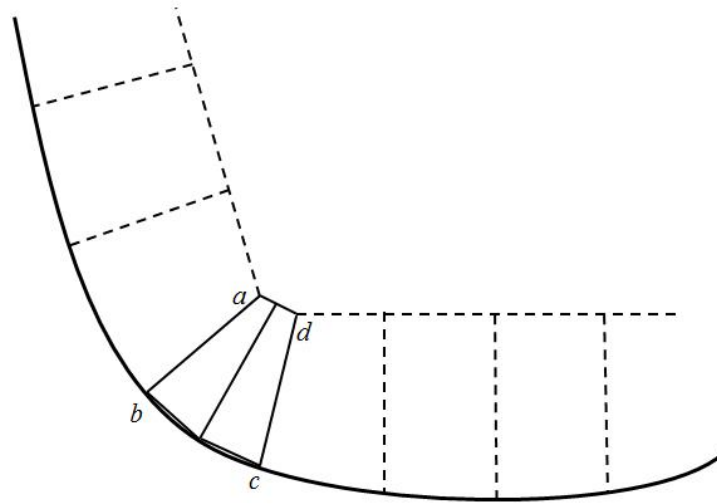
Typical irregular slab panel located at the edge of a floor layout
